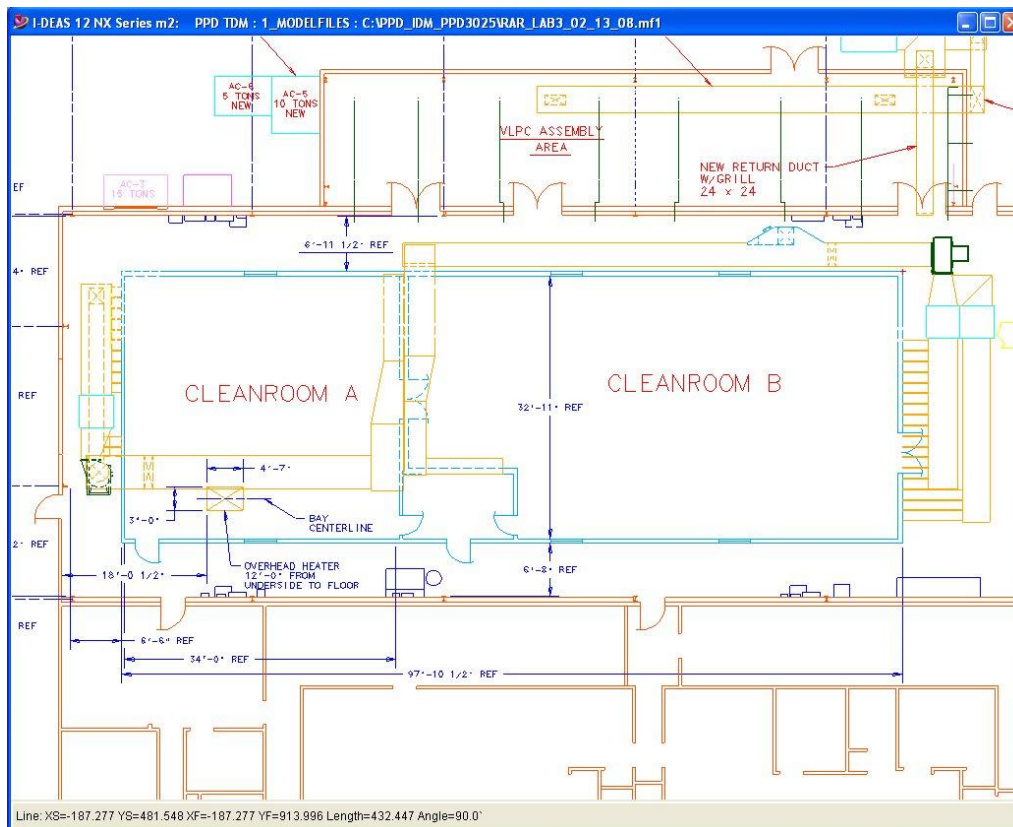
Plan view of cleanrooms A and B. Recirculation HVAC is shown.
